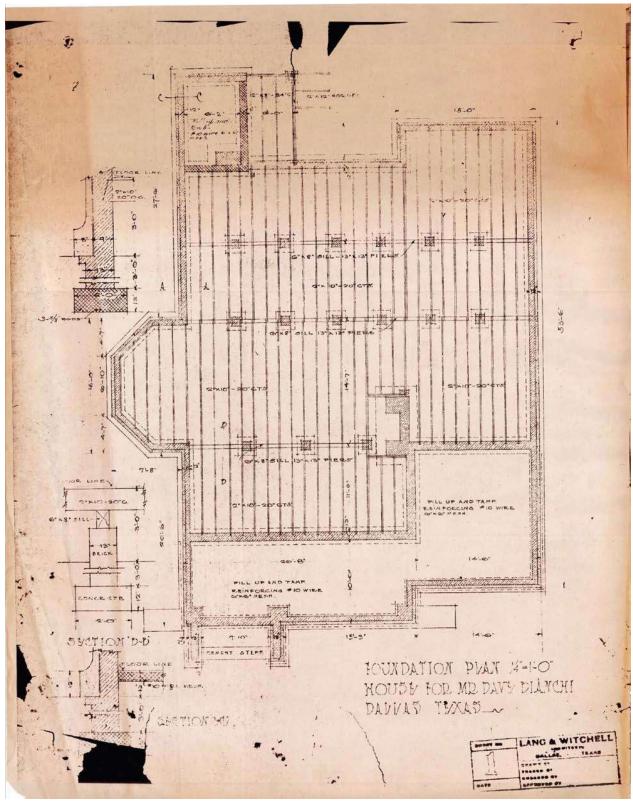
Original Lang and Witchell Foundation Plan – Sheet 1
